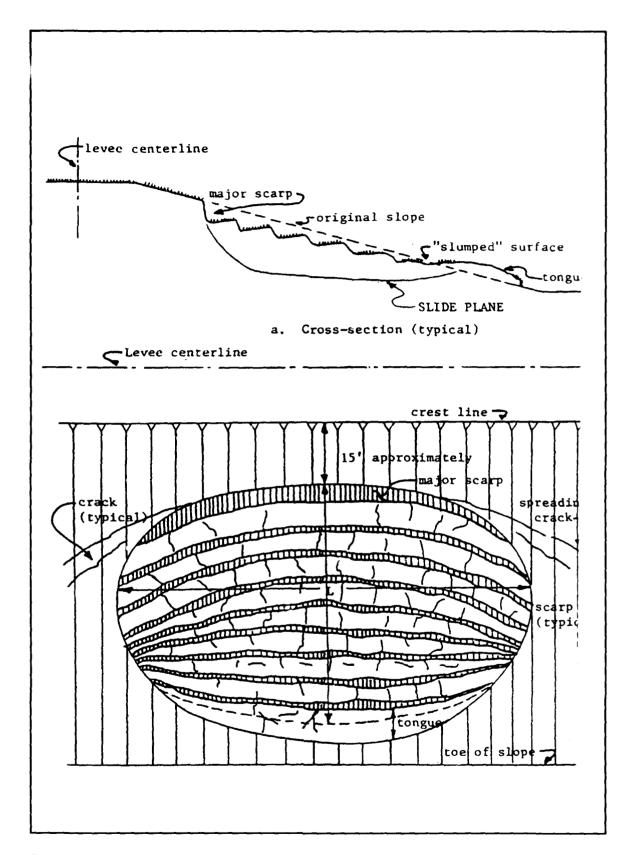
Typical slough slide: (a) cross section; (b) plan view
